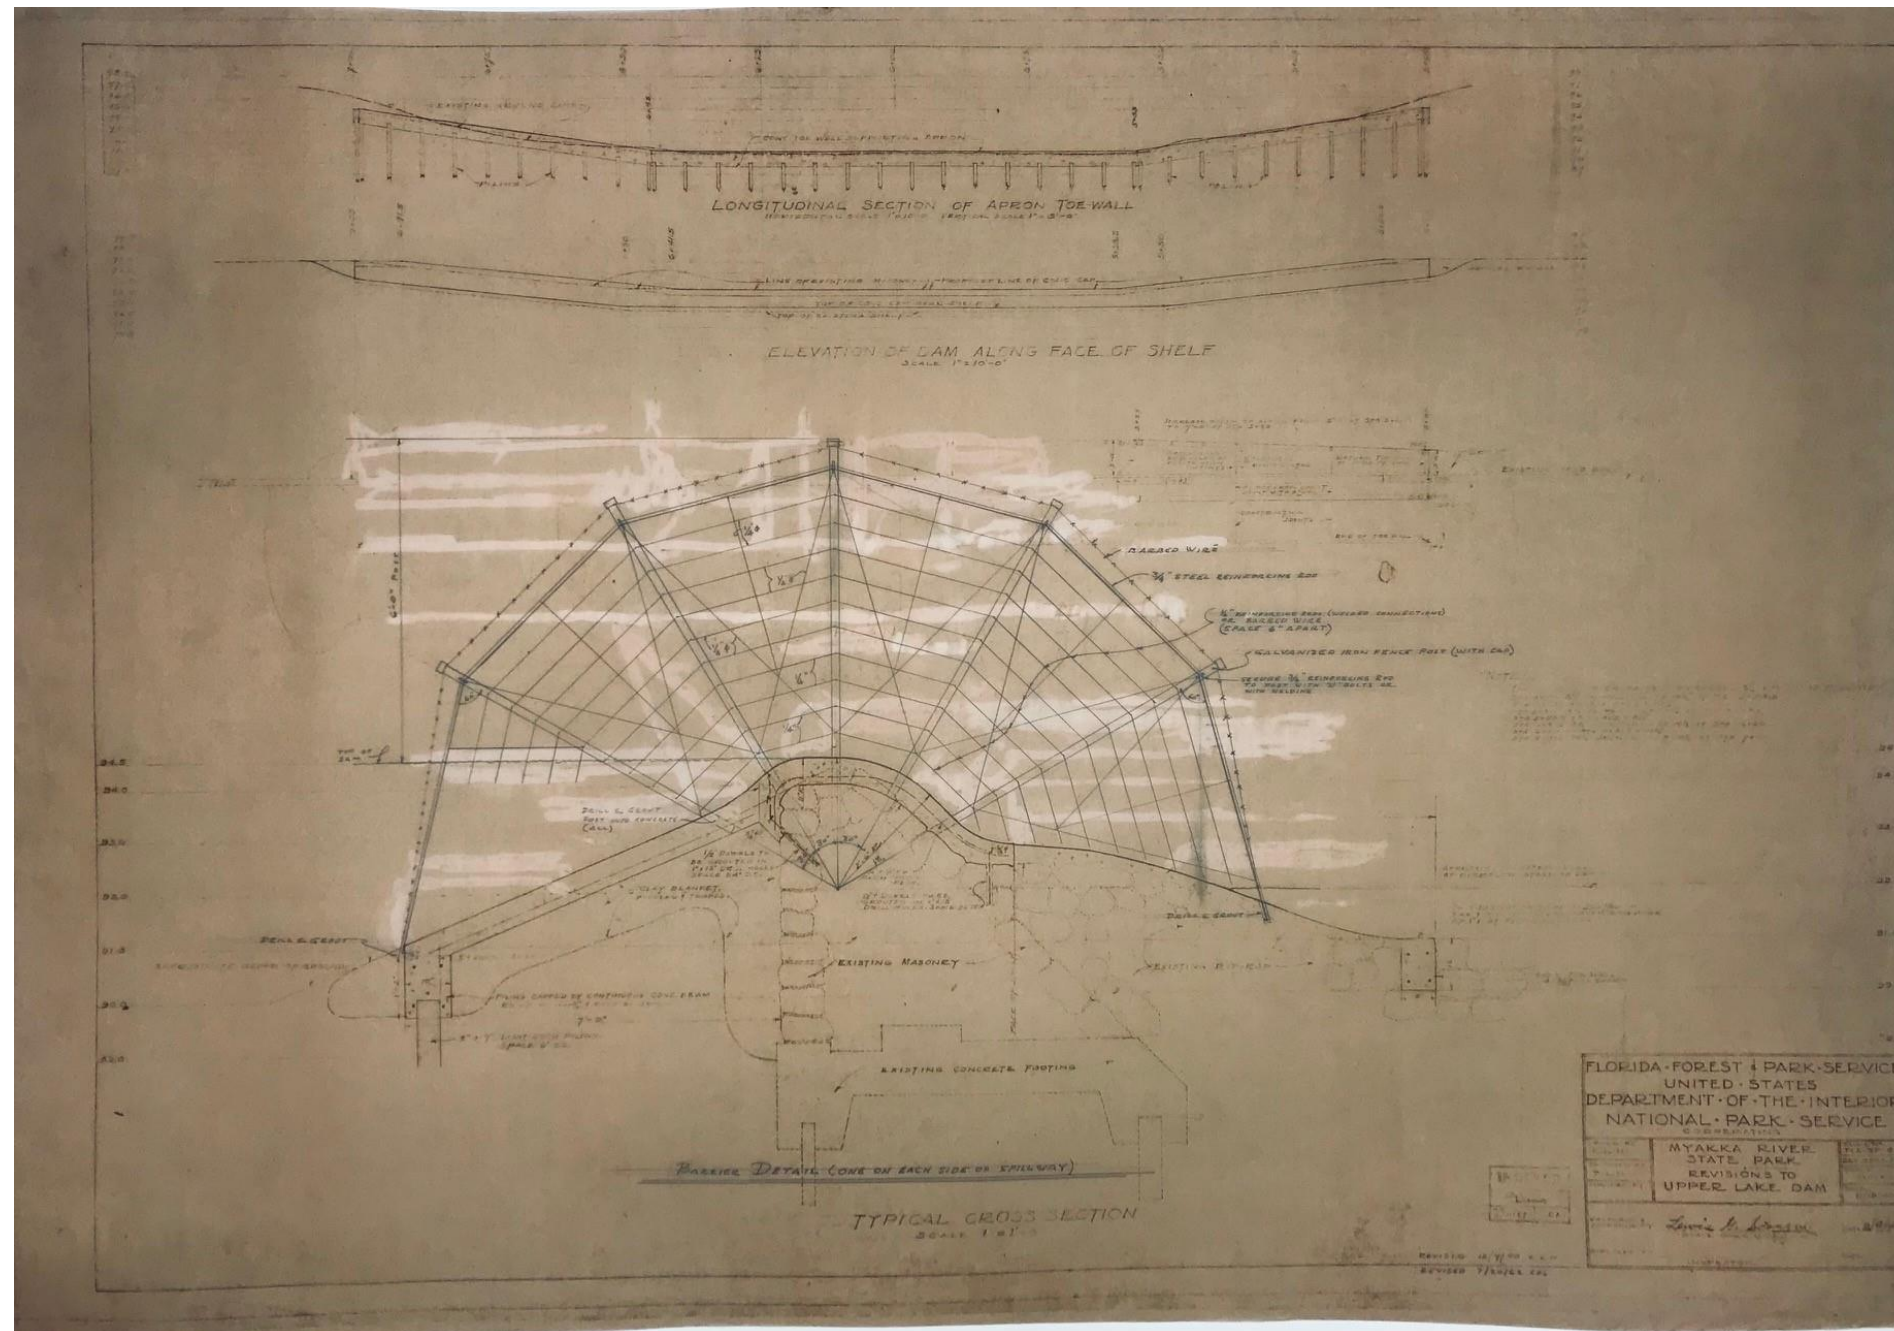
Detailed plans from 1940 revisions to Upper Myakka Dam (8SO2273) on the Upper Myakka Lake, showing typical cross section, longitudinal section of apron toe-wall, and elevation of dam along face of shelf.
